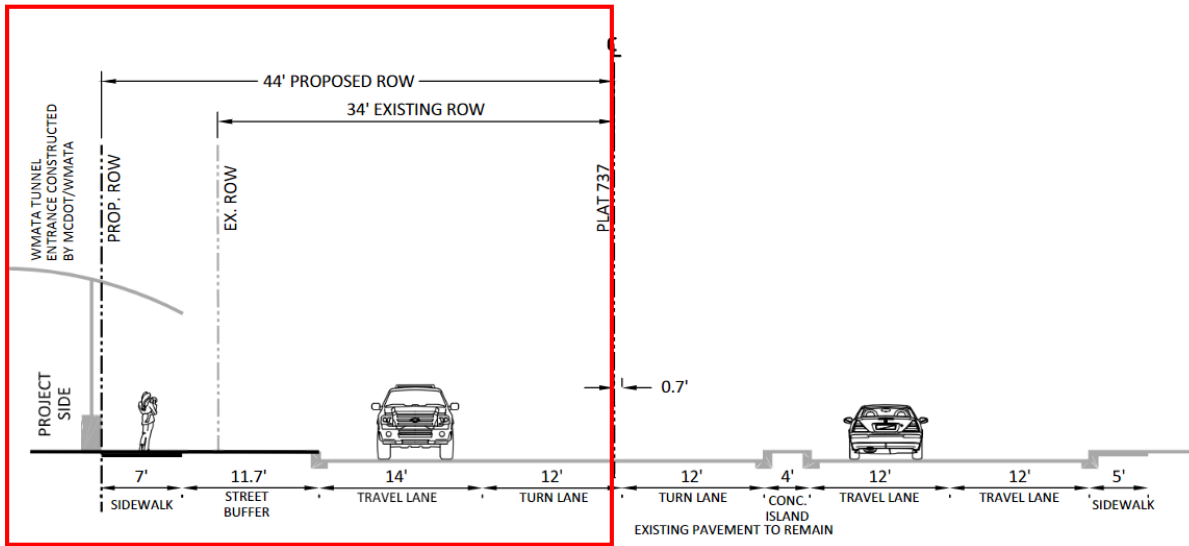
Forest Glen Road Interim Cross-section (Property Frontage in Red)
